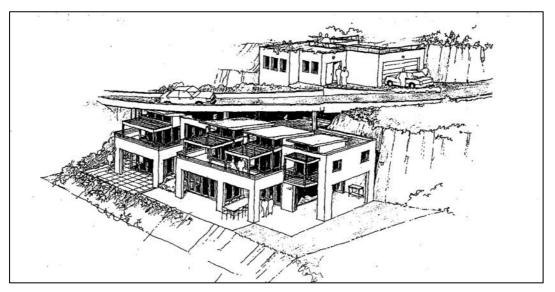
Indicative concept sketch showing a potential dwelling constructed as part of the proposed subdivision.
